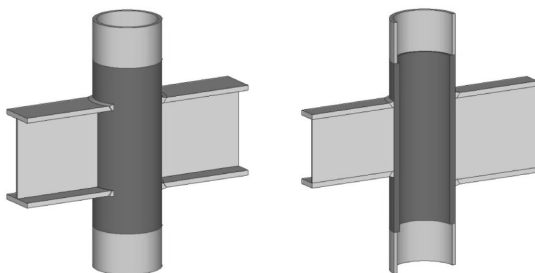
Design technology for column to beam connection of circular hollow section steel columns
